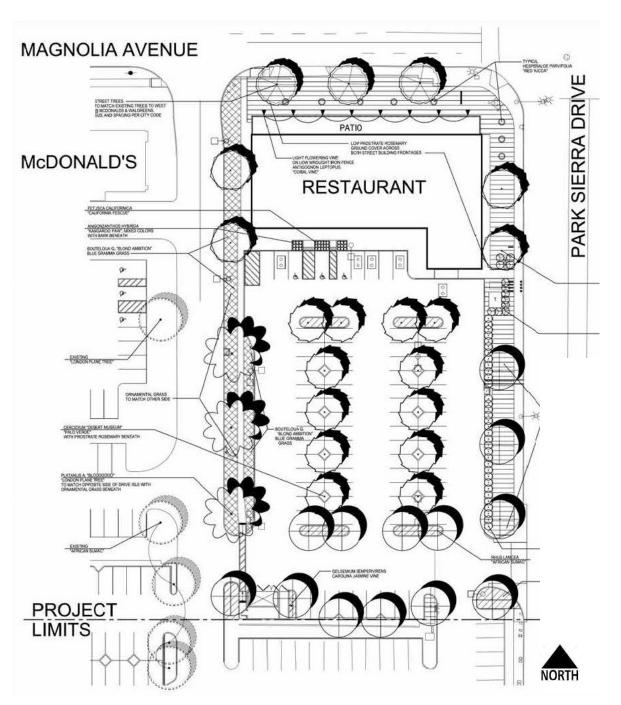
Project Plans (Conceptual Landscape Plan)
